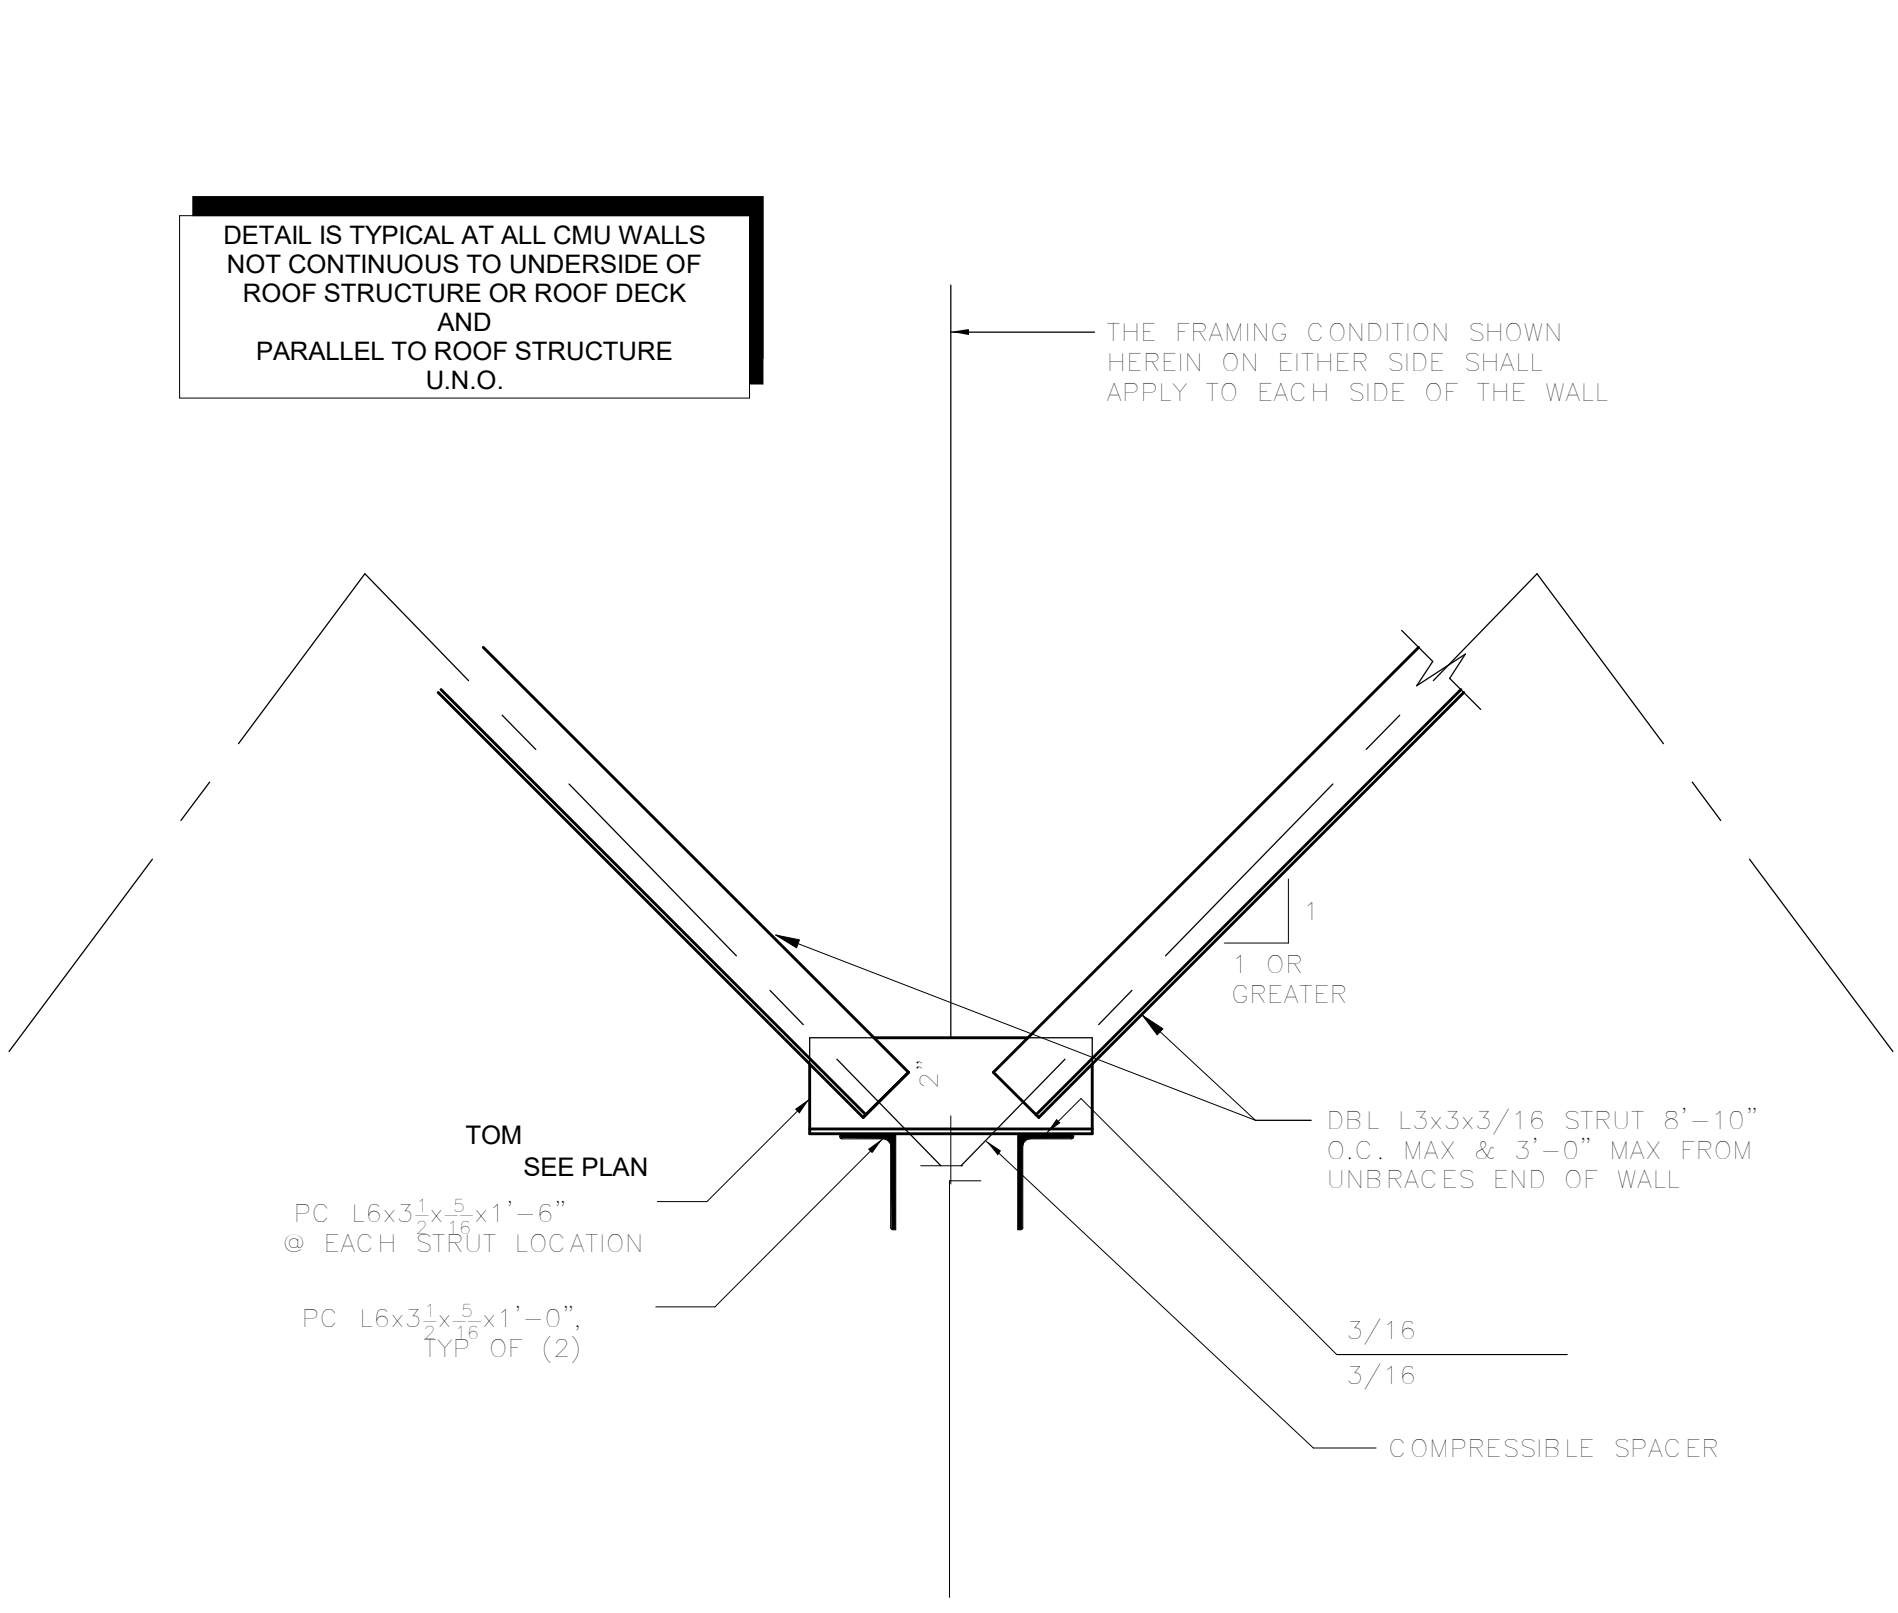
DETAIL DOES NOT APPLY WHEN WALL INDICATED IS INTERSECTED BY PERPENDICULAR WALLS OF EQUAL OR GREATER HEIGHT AT BOTH ENDS, WITH THE HORIZONTAL LENGTH OF THE WALL IN QUESTION BEING LESS THAN 36 FEET FOR 12 INCH WALLS, 24 FEET FOR 8 INCH WALLS, AND 18 FEET FOR 6 INCH WALLS, AND WALL INDICATED IS ANCHORED TO PERPENDICULAR WALLS WITH PREFORMED "T" OR "L" JOINT REINFORCEMENT
